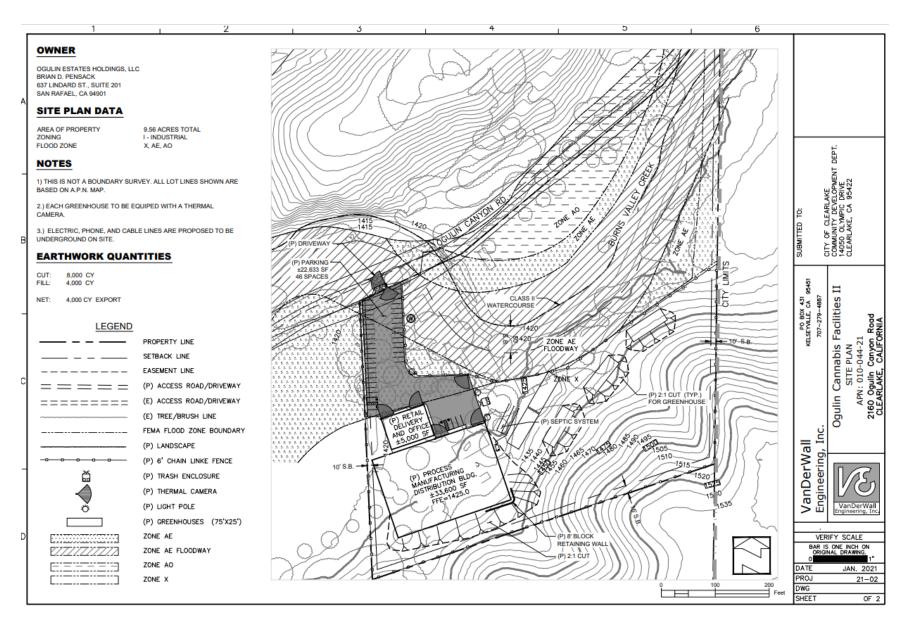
Site Plan for the proposed project at APN 010-044-21.
